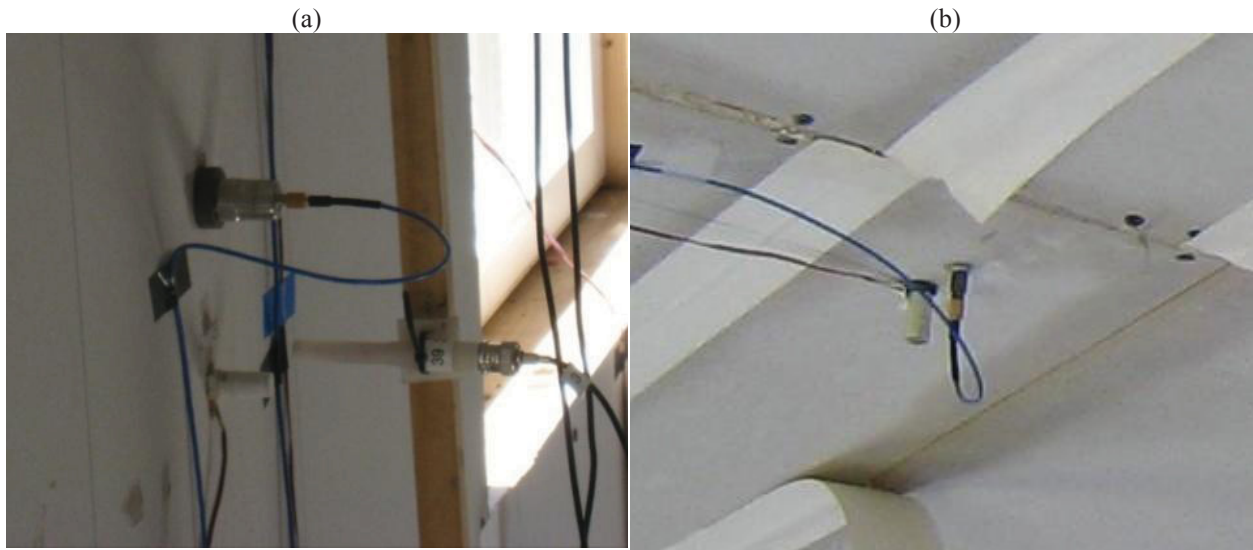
(a) PCB 330A and PCB 338B34 accelerometers and (b) PCB 330A and PCB 353B18 accelerometers mounted to single room structure for modal testing.
